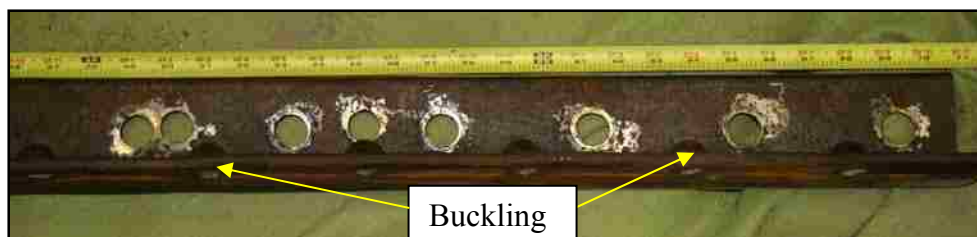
East Angle Rivet Hole Deformation – Specimen 17R
